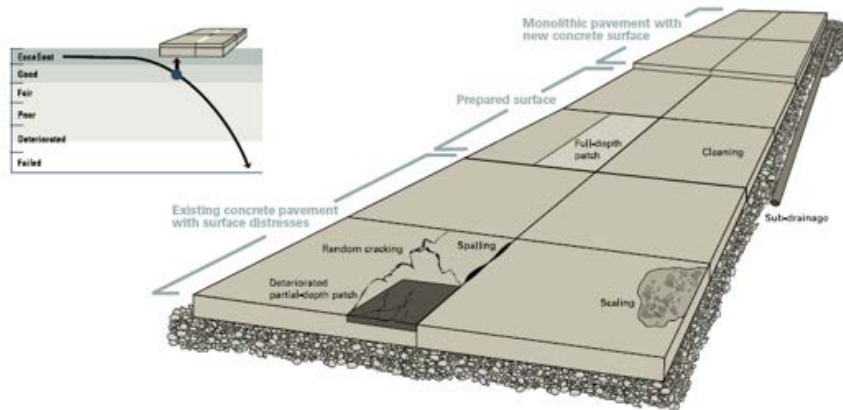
Bonded concrete resurfacing of good condition concrete pavement (Harrington et al. 2007)
